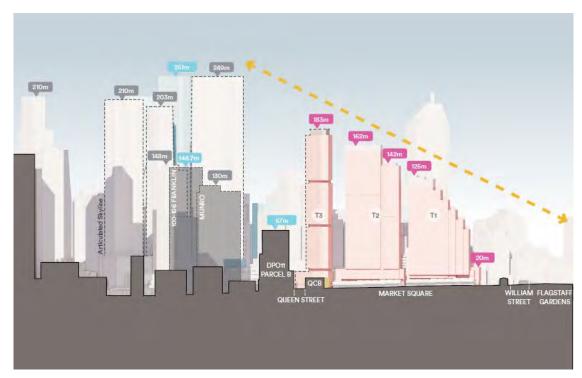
Northern elevation showing the proposed towers within the surrounding context
